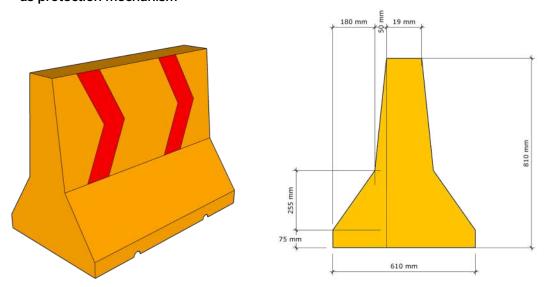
Dimensions of concrete block as barrier to protect pedestrians and cyclists
